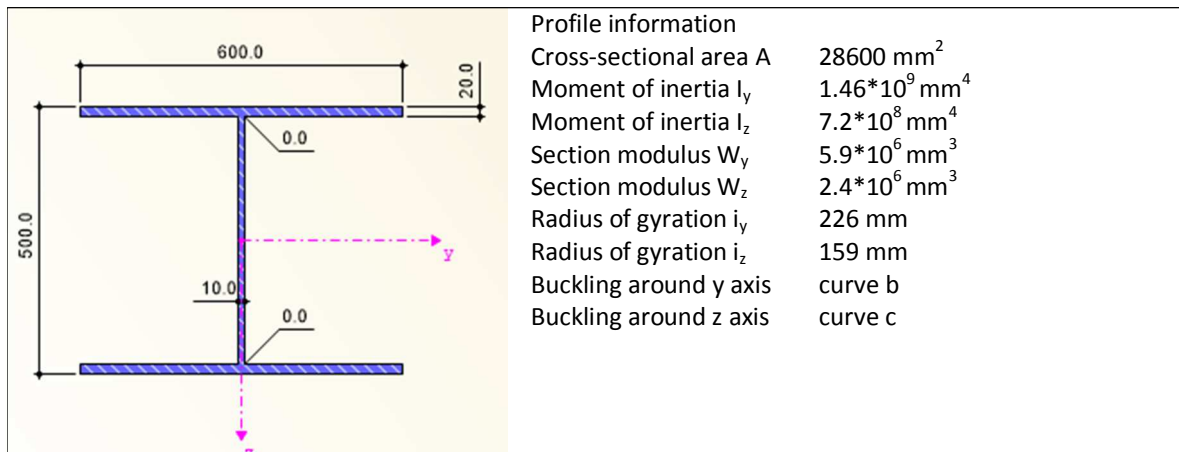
Welded steel section strut, steel grade S235 and dimensions in mm
